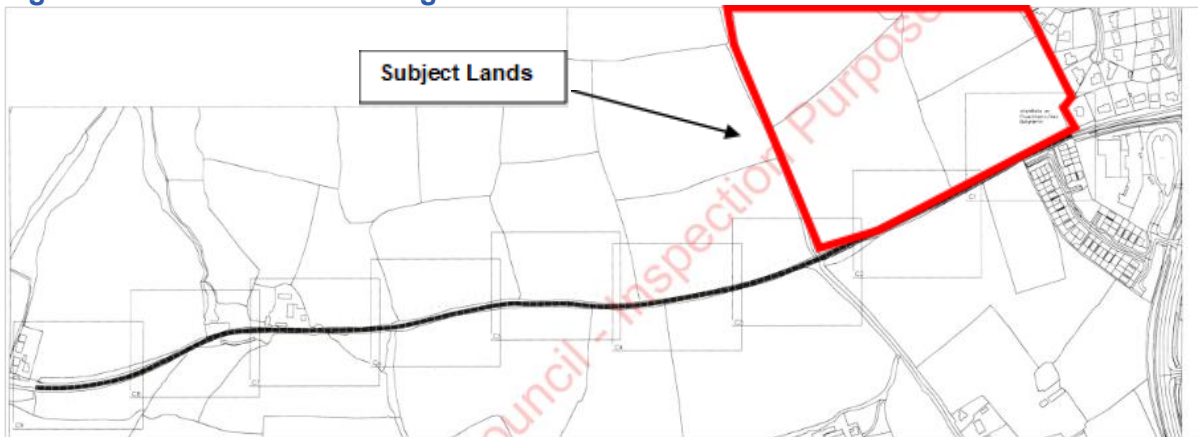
Recently Completed Rocky Road Improvement SchemeFigure 5: Part 8 Road Widening
